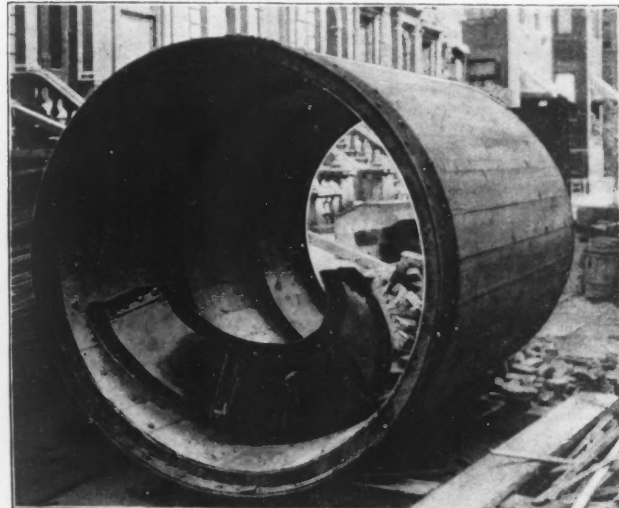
View of Cutting Edge Showing Detached Section of Roof.
